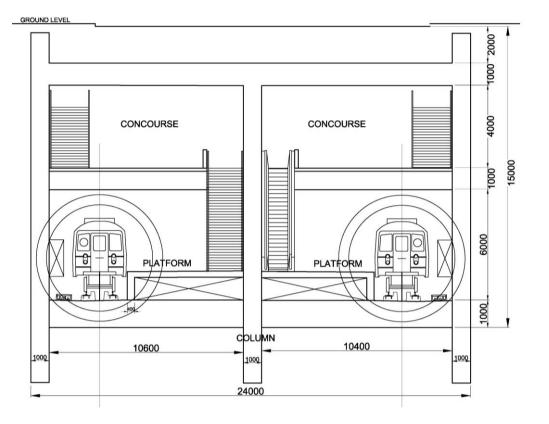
TYPICAL UNDERGROUND STATION
